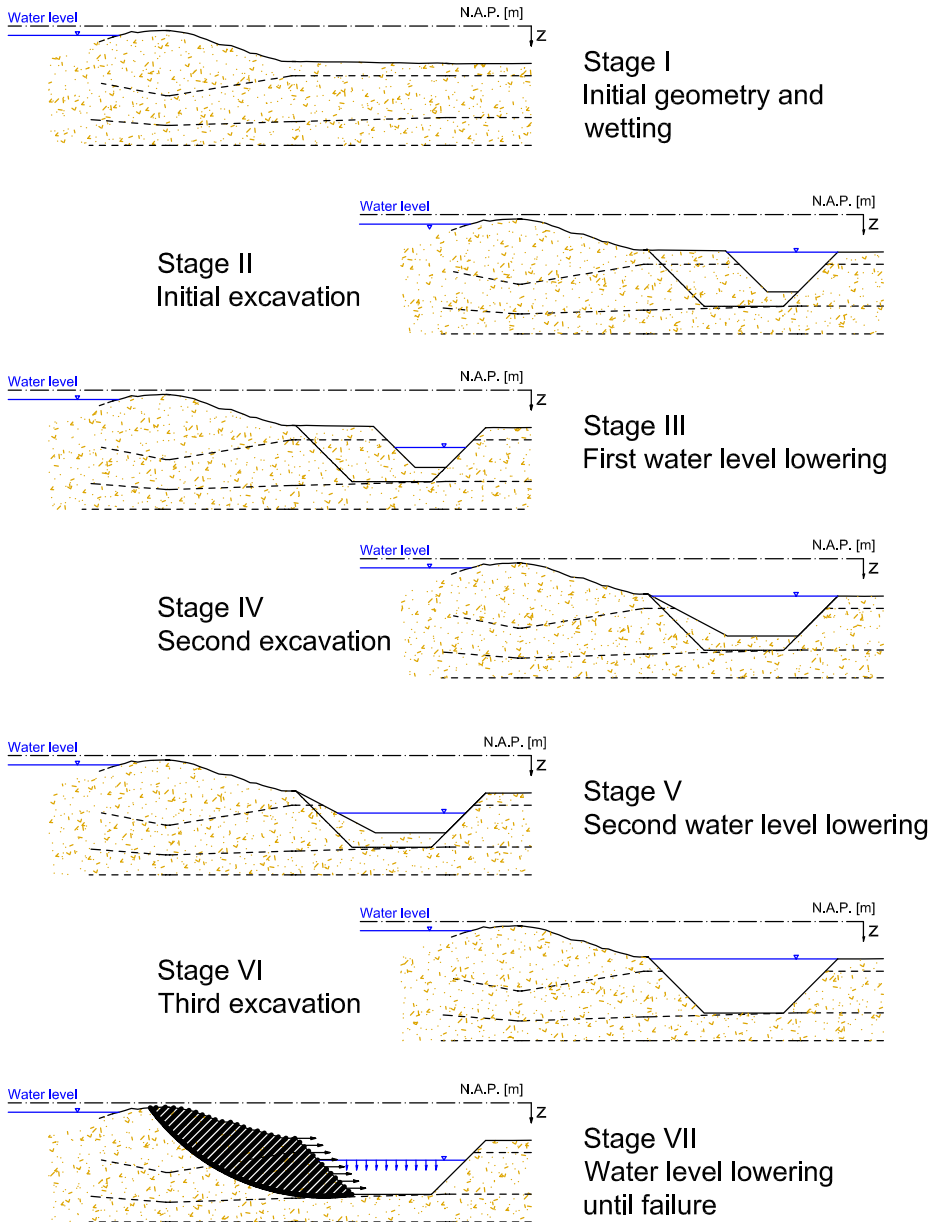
Stages in the failure test, (Stage I), initial geometry with artificial rain from the crest, (Stage II), initial excavation with the excavation filled with water, (Stage III), water level lowered by 1.0 m, (Stage IV), second excavation with a 2:1 (h:v) slope from the toe of the dyke and widening of the bottom of the ditch and filled with water, (Stage V), water level lowered by 1.0 m, (Stage VI), third excavation 1:1 slope from the toe of the dyke and deepening of the ditch by 0.5 m, (Stage VII), lowering of the water until failure.
